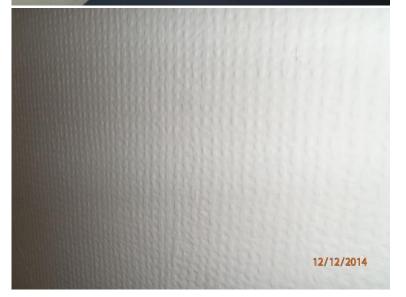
AC ceiling tiles throughout Shops 24 and 25 (assumed asbestos containing).
